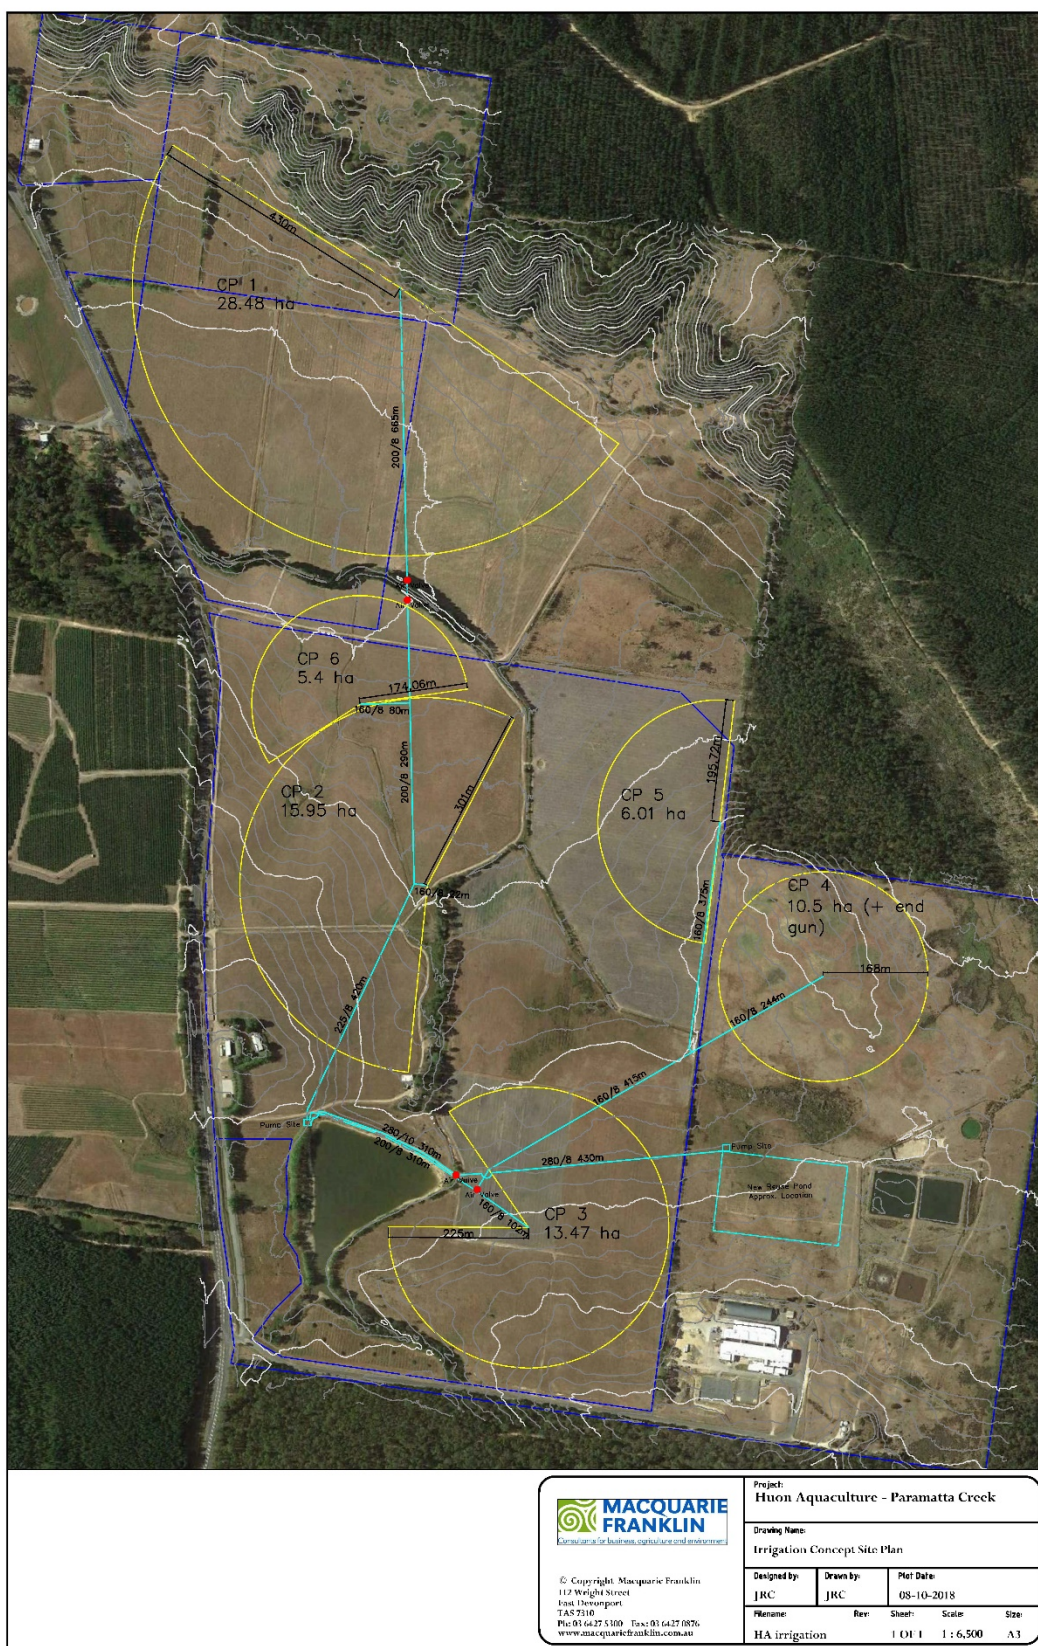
Proposed irrigation concept site plan for wastewater from the Parramatta Creek fish processing facility
